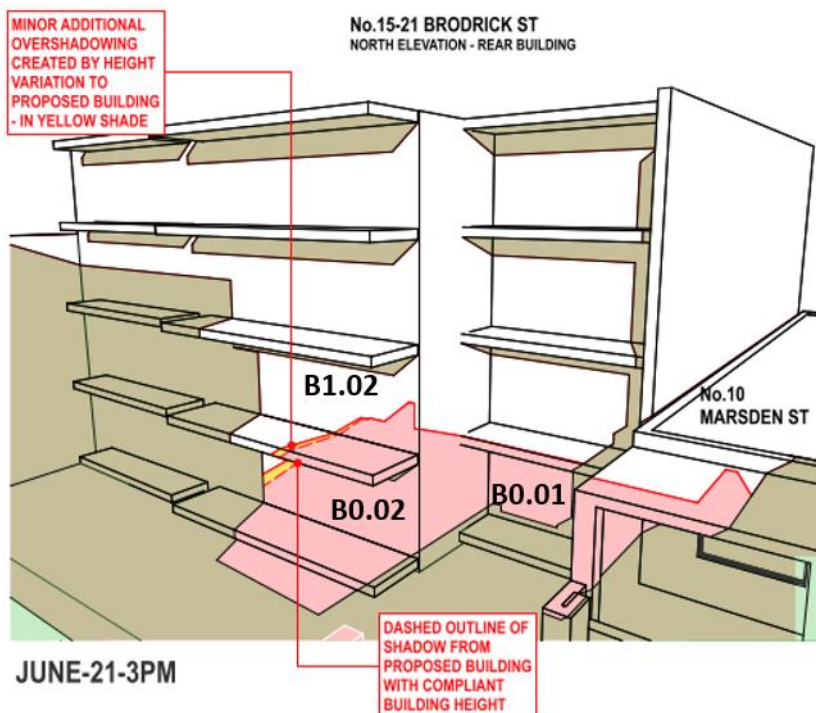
Proposed overshadowing to 15-21 Marsden Street at 3pm
